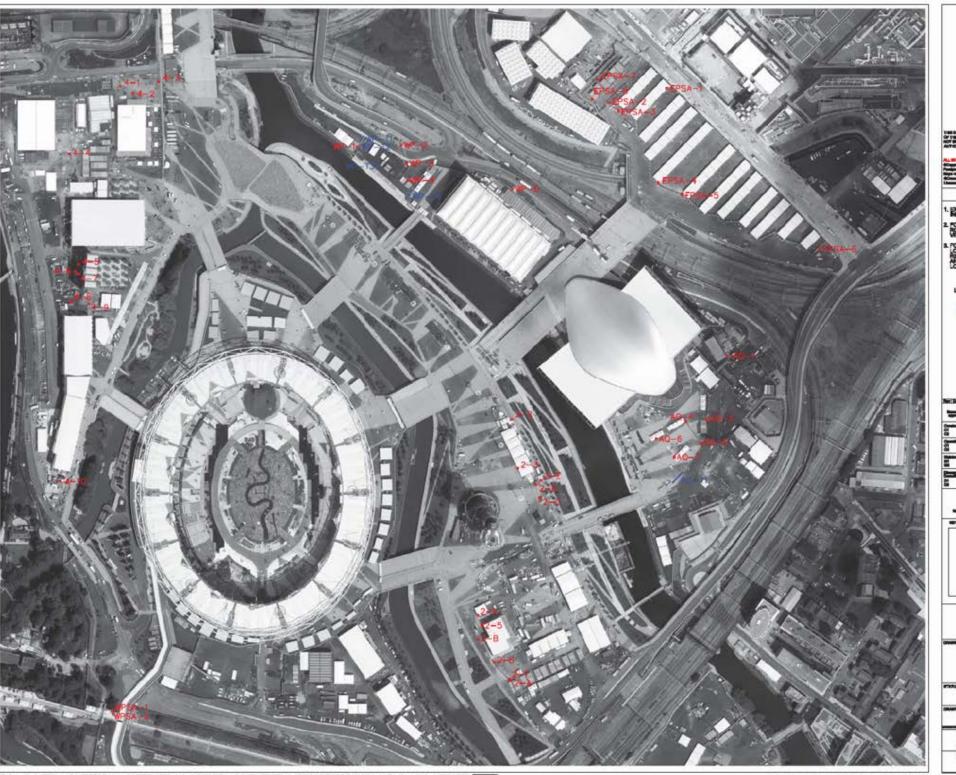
(ATK-C-O-XX-XX-ALL-GE-XX-8055): Pavement Details
